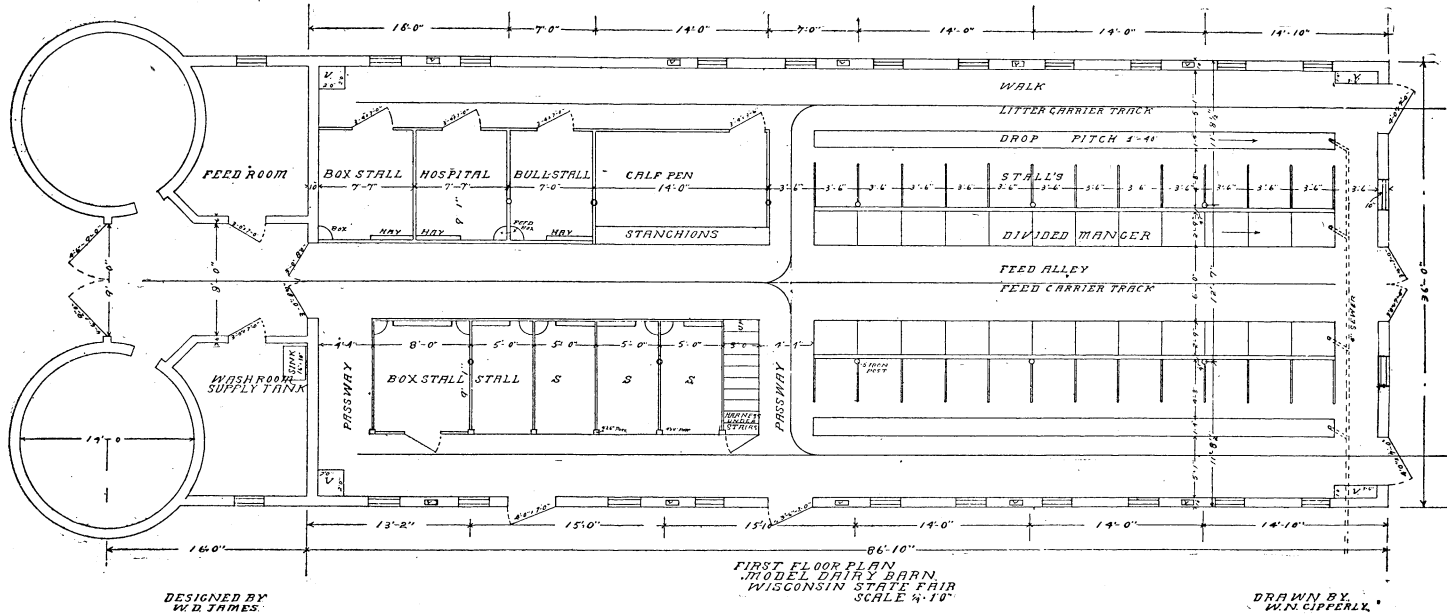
FIRST FLOOR PLAN OF MODEL DAIRY BARN AT THE WISCONSIN STATE FAIR.
